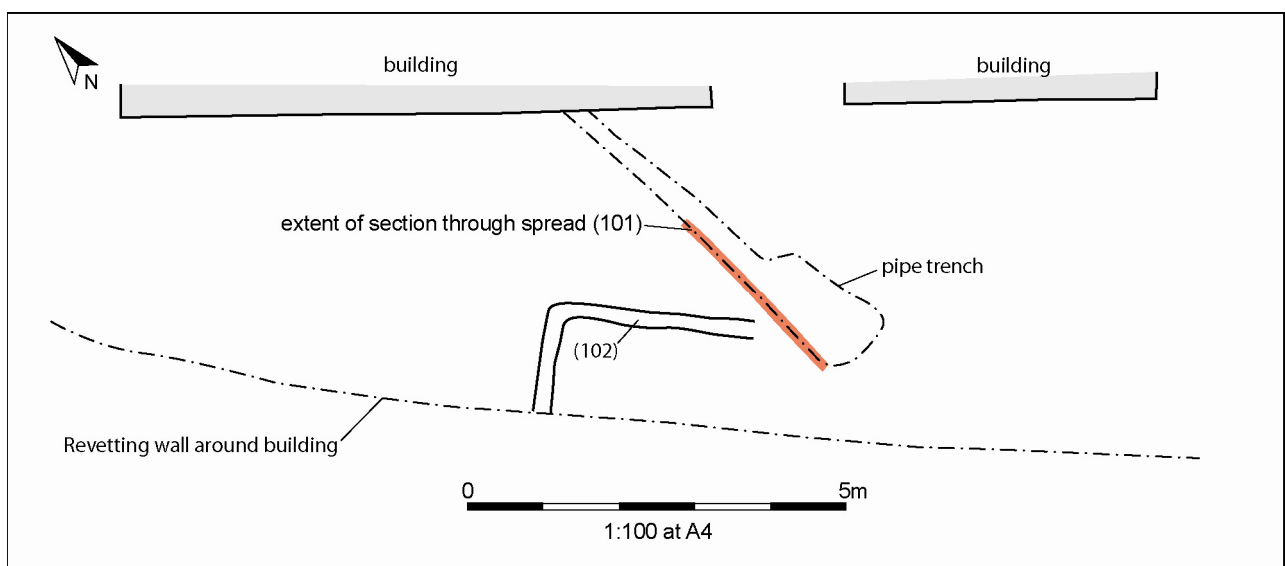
Site plan showing the pipe trench in relation to the engine house.
